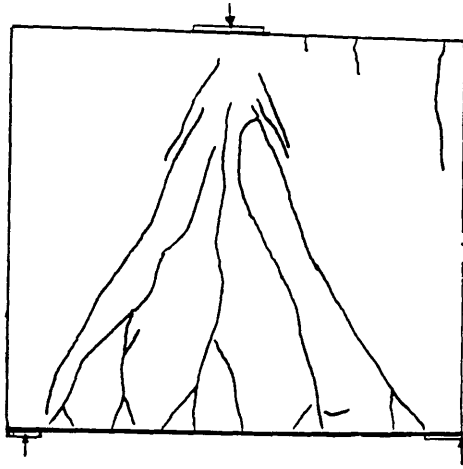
Predicted crack pattern and deformed shape at 600kN (TRGRAS7)
